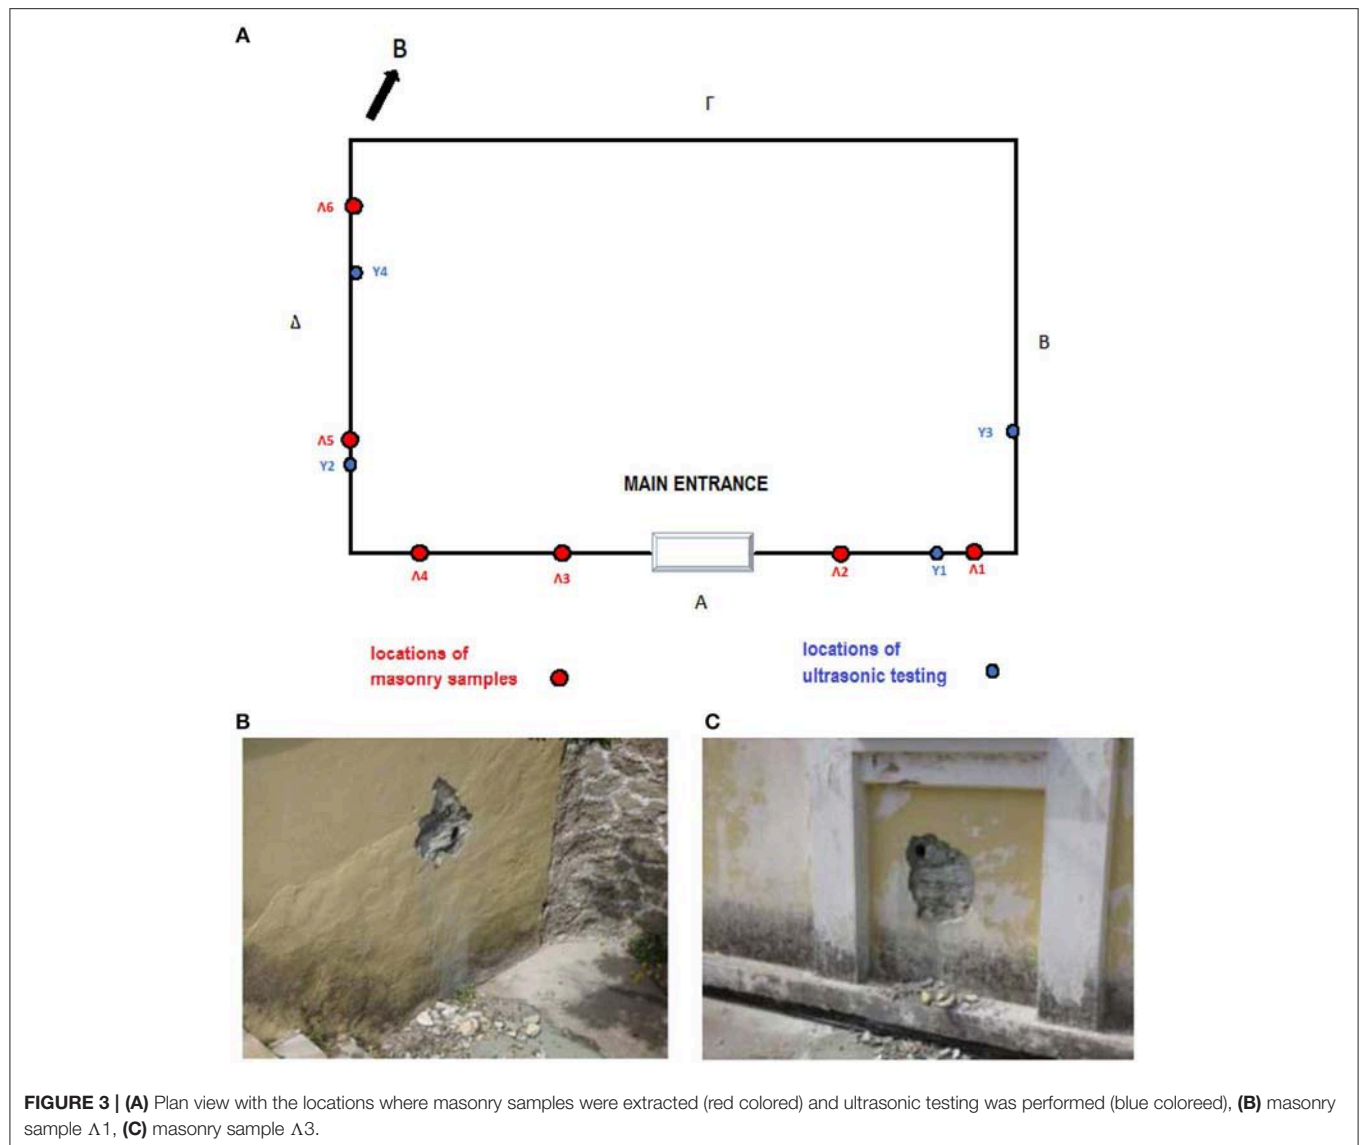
| (A) Plan view with the locations where masonry samples were extracted (red colored) and ultrasonic testing was performed (blue colored), (B) masonry sample A1, (C) masonry sample A3.
